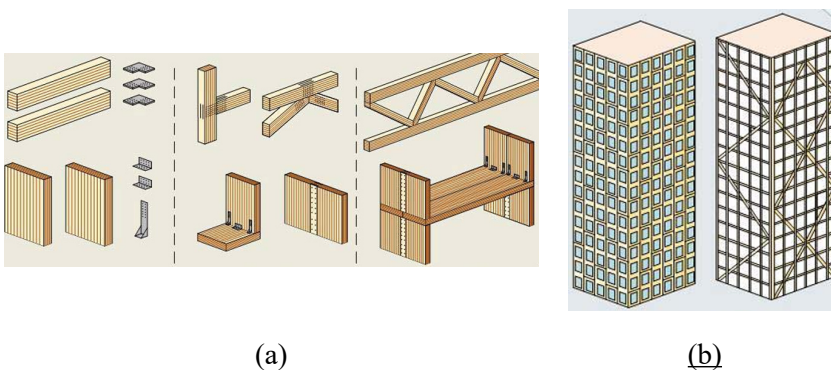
(a) Components, connections, and sub-assemblies, (b) wooden high-rise building created by connections (Abrahamsen et al., 2020)
